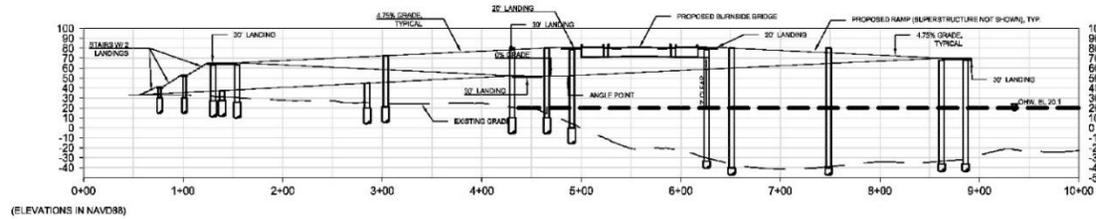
Ramps on North and South Sides of the Bridge and Stairs on South Side
